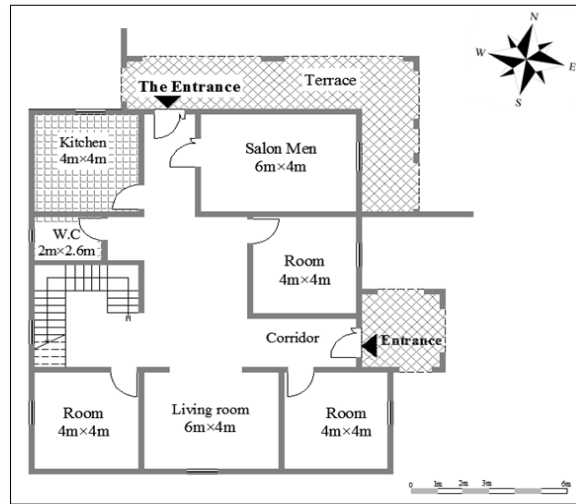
A plan of Arabi Belhadj house in Gharyan.
